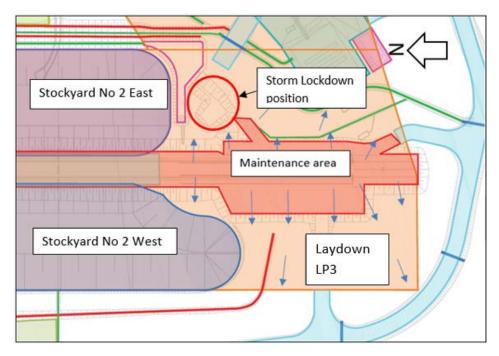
Stacker Reclaimer Berm Southern Section Drainage Plan
